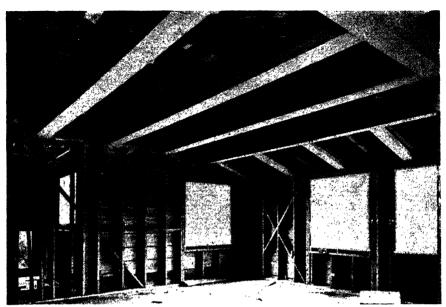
Beamed ceiling with preformed coils. (Robert Bruen & Son.)
